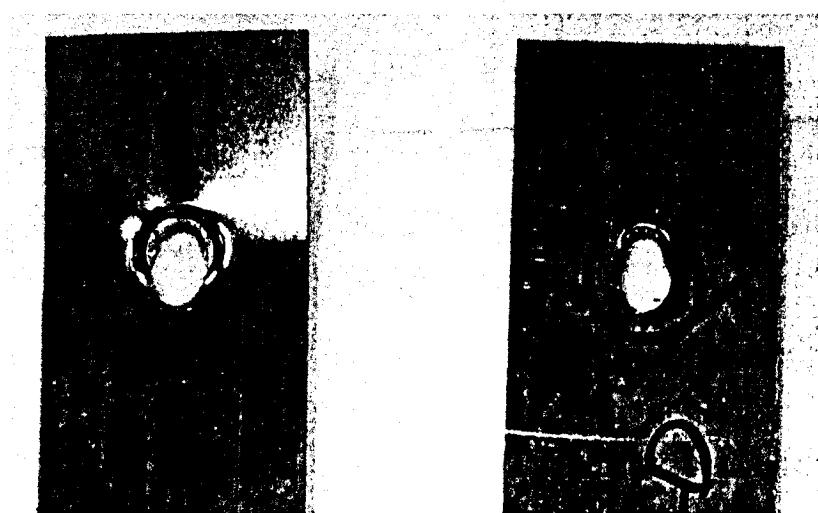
Type A Bearing Failure: 064-550-1/2-SS-C (left) and 064-550-1/2-SS-D (right)
